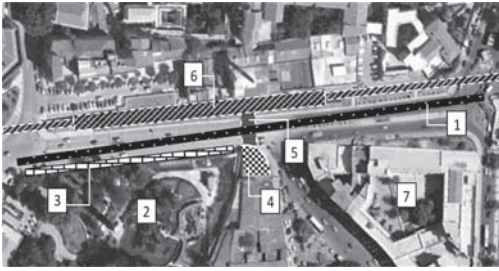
Plan view. 1) Tunnel layout 2) Park 3) Retaining wall 4) Subway Ticket Office 5) Pedestrian underpass 6) Subway line 7) Buildings.
